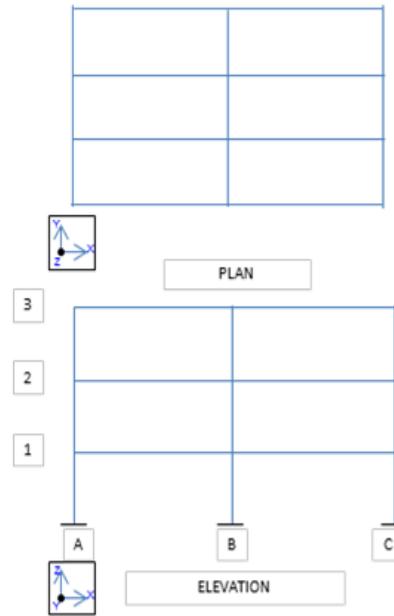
Plan & Elevation of G+2 reinforced concrete building frame
